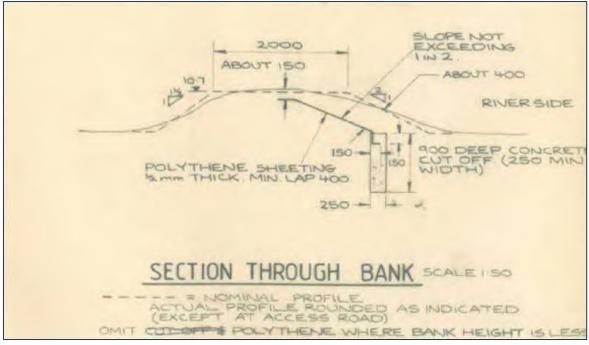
Excerpt from original design drawing of flood wall by Allen Gordon Consulting Engineers (4 of 5)
